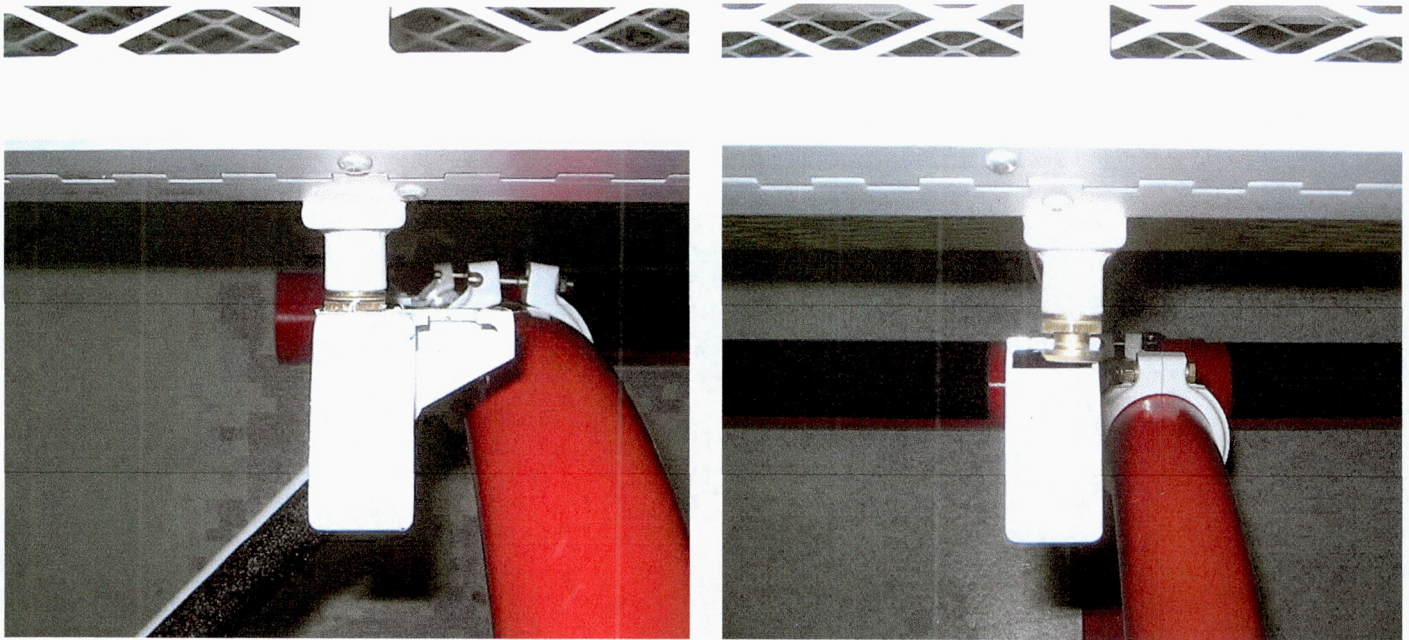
Beam Adjustment, Step 1 – Beams too close together
